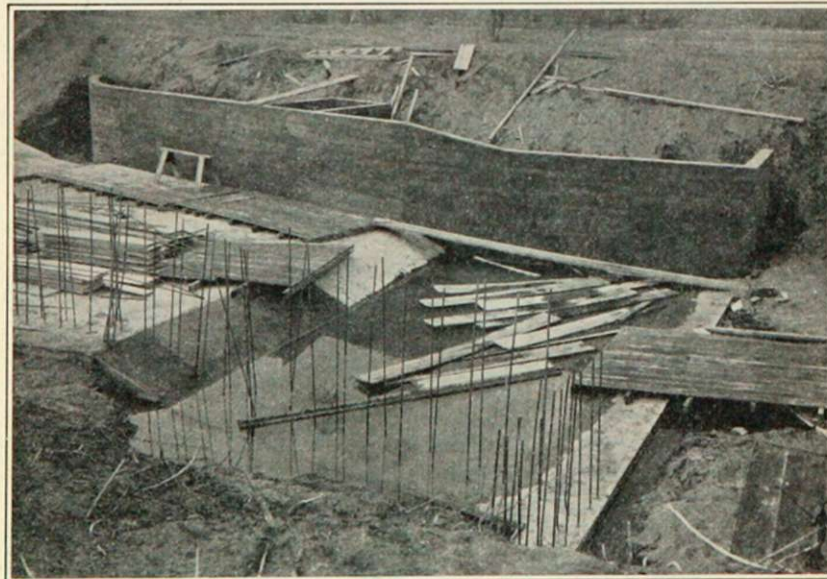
Partly completed reinforced concrete 20-foot Parshall Measuring Flume on the Bijou Canal, South Platte River, near Greeley, Colo.
